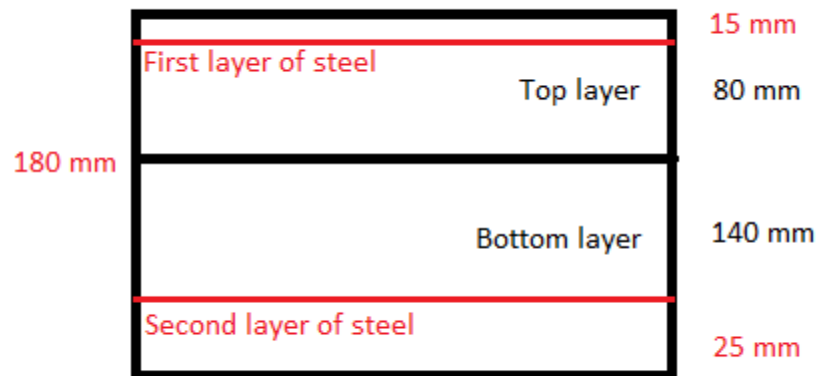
Steel reinforcement for concrete pavements, x-, y- direction
